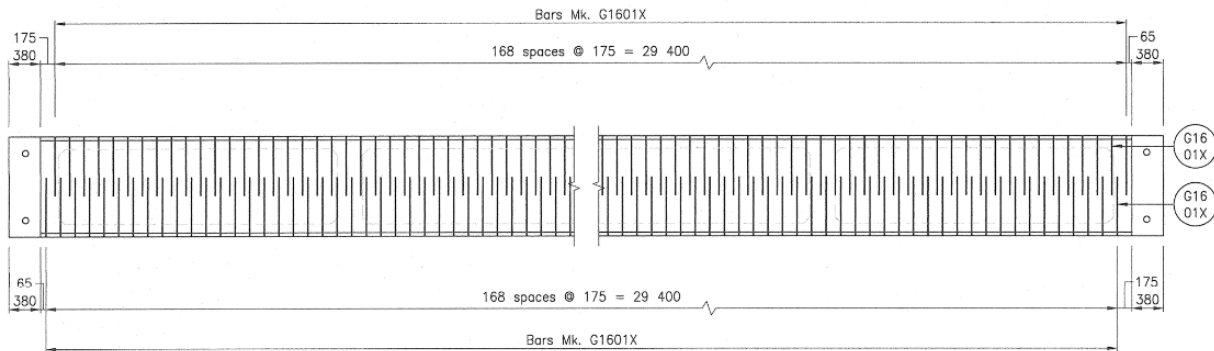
Bridge Design Drawings Dowel Layout Interior Prestressed Girder Plan View (WSP 2018)
